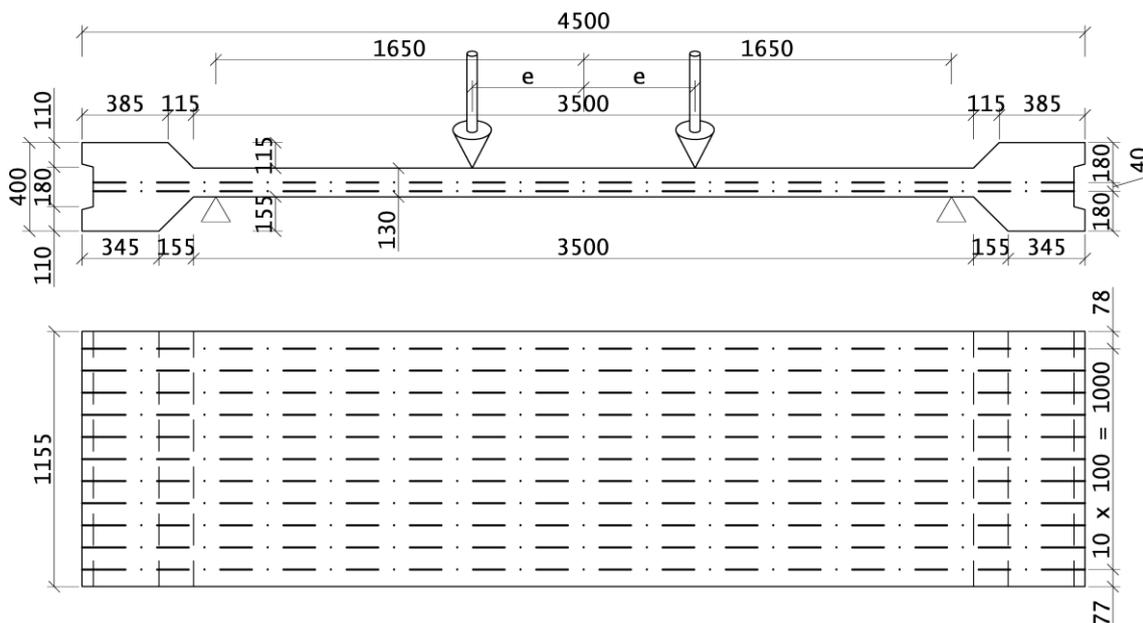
Static scheme with the dimensions and the prestressing scheme in the slabs
